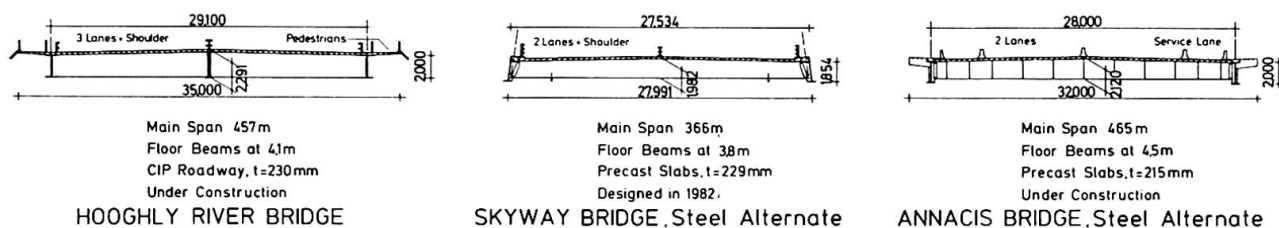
Cross-sections of long-span cable-stayed composite bridge beams
